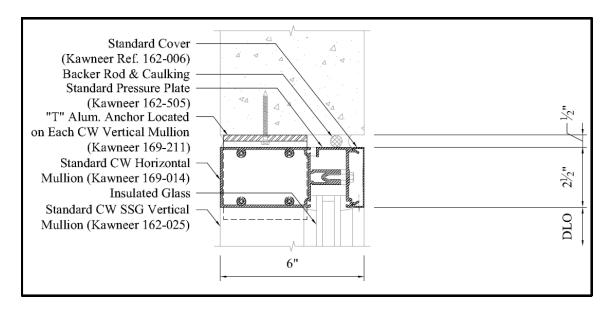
Standard head mullion detail, Kawneer 1600 SS curtain wall system. Adapted from Kawneer Inc. (2014).
